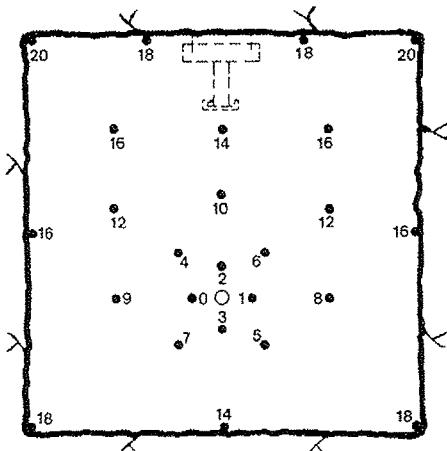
Drilling and firing pattern for 4 sq.m. raise shaft.
